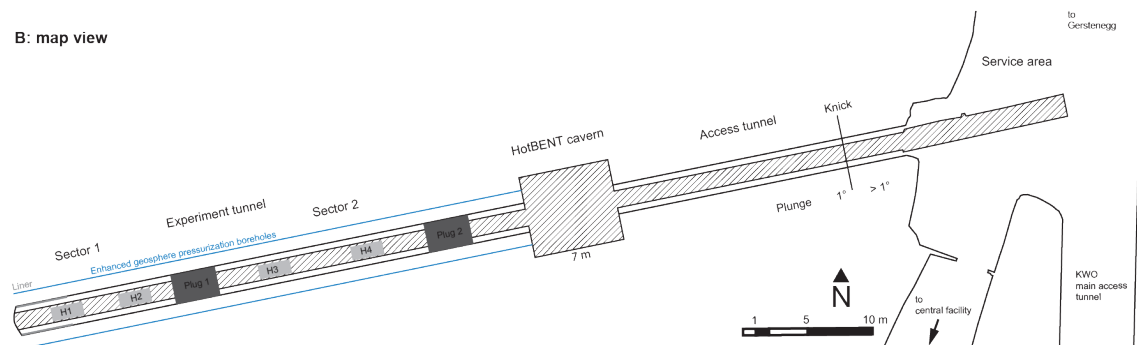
Layout of HotBENT test (current design): A) vertical section, B) plan view showing HotBENT cavern
